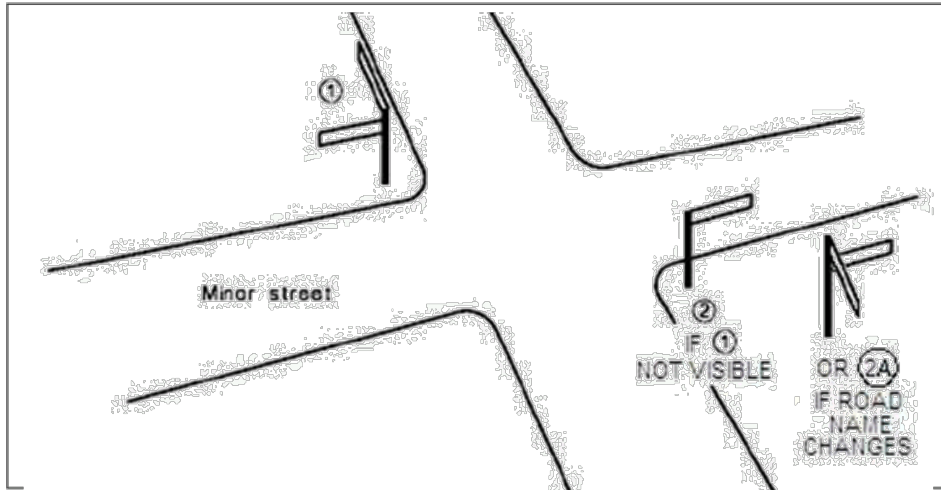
INTERSECTION WITH UNDIVIDED MAJOR STREET
